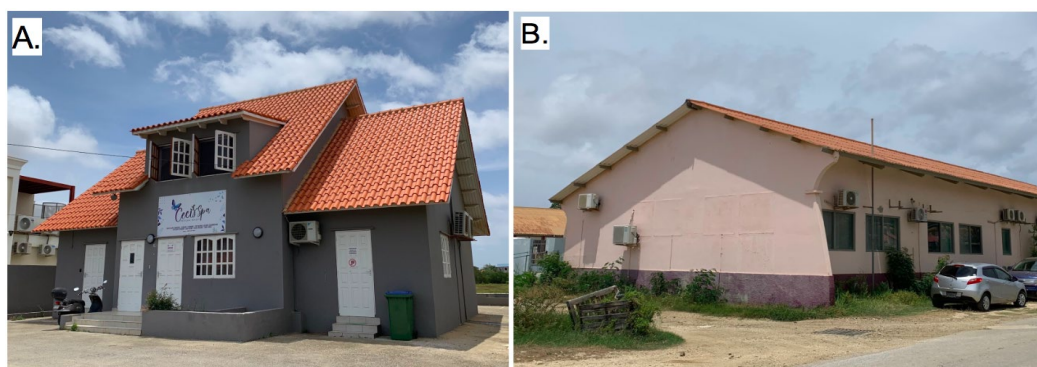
Two applications of building-level protection measures found in Kralendijk: A) elevated building foundation and B) dry-proofing (photos: author)
